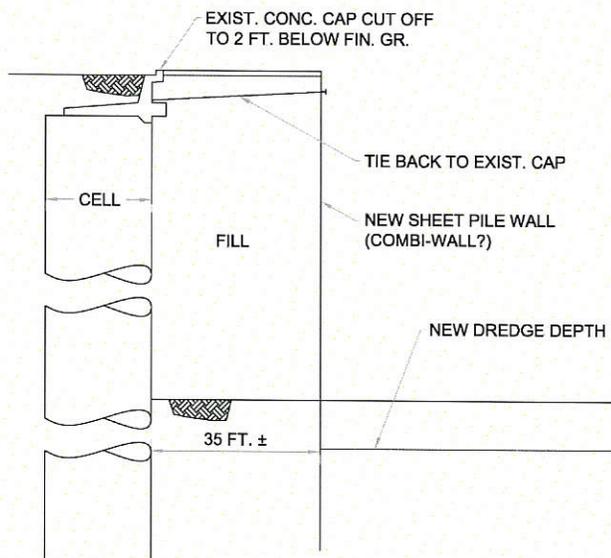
Concept Alternative – Wall Enclose Existing Dock
